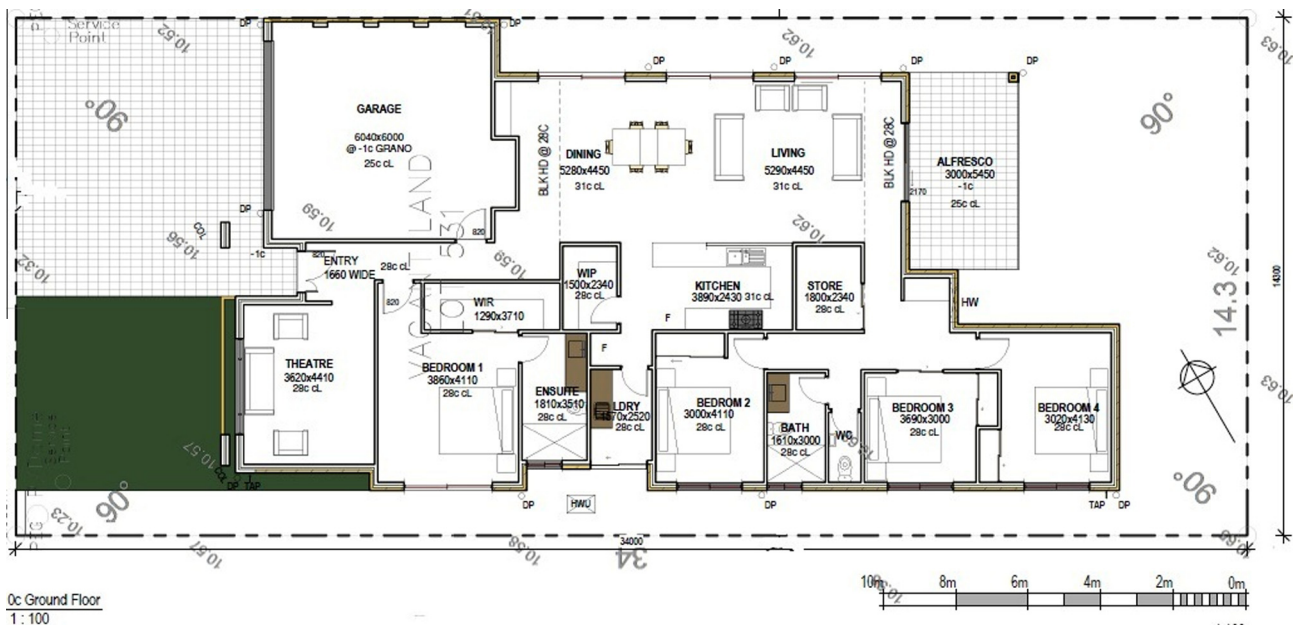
Floor plan of a typical 4 × 2 × 2 house in Perth.
